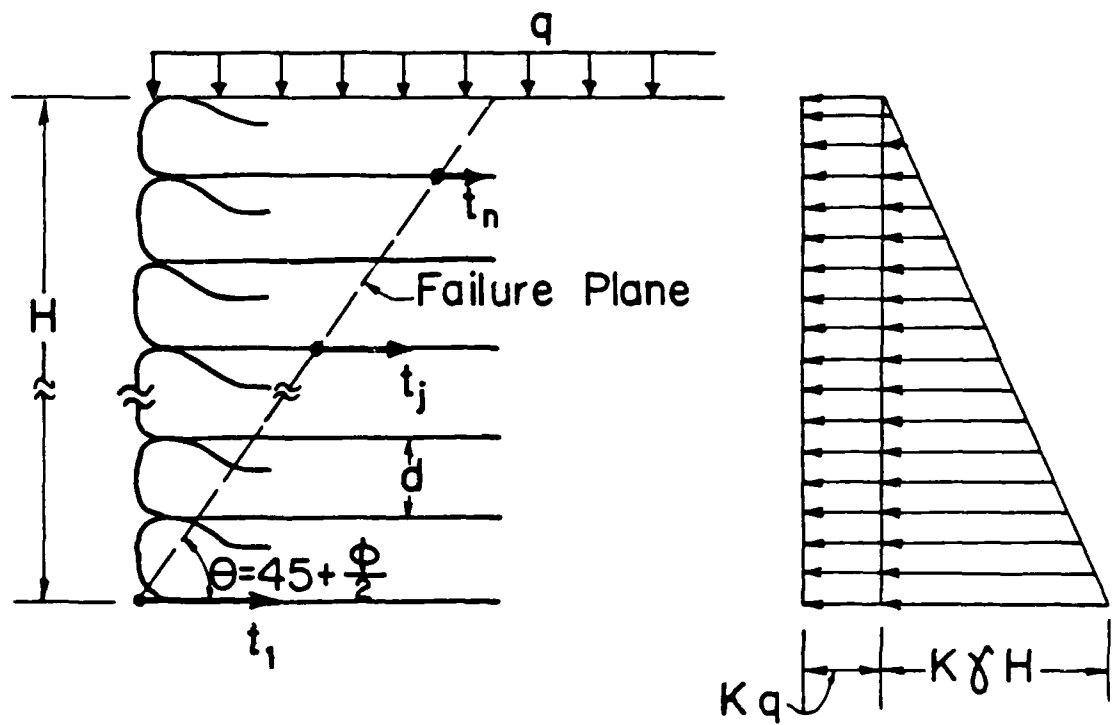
Section through the geotextile-retained earth wall and assumed lateral earth pressure distribution
